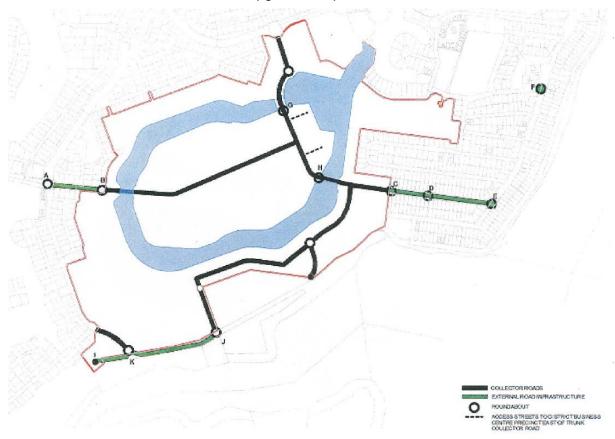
Existing Drawing 3 in the Infrastructure Agreement
